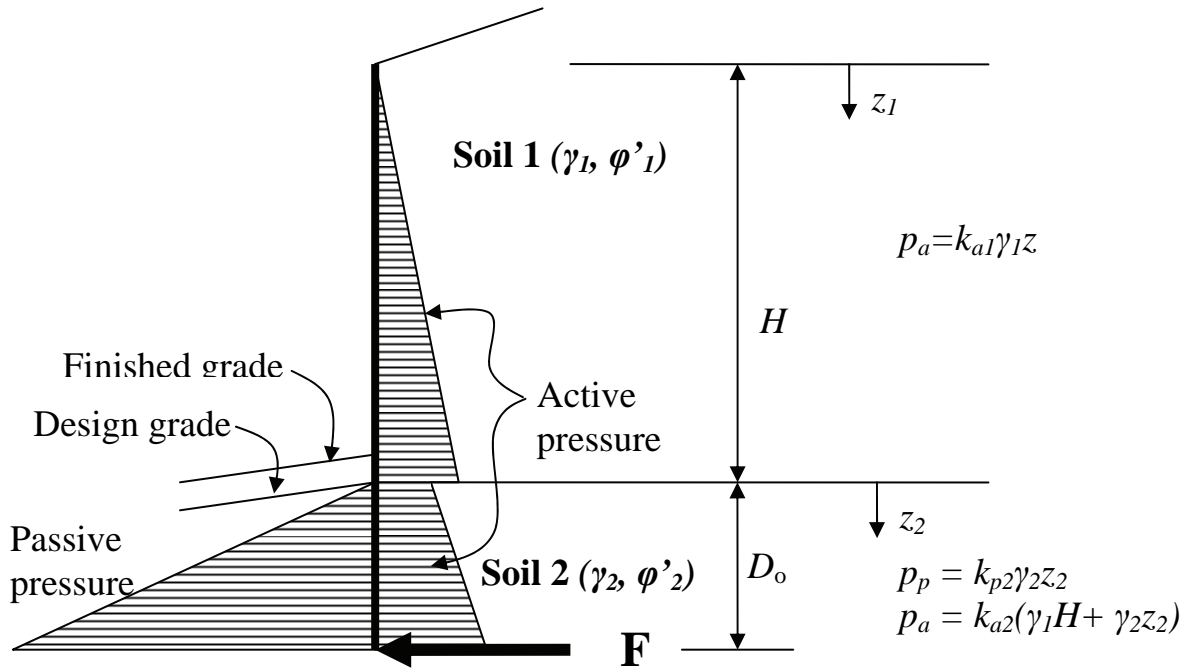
Simplified Earth Support Diagram for a Cantilever Wall using Effective Stress Strength
